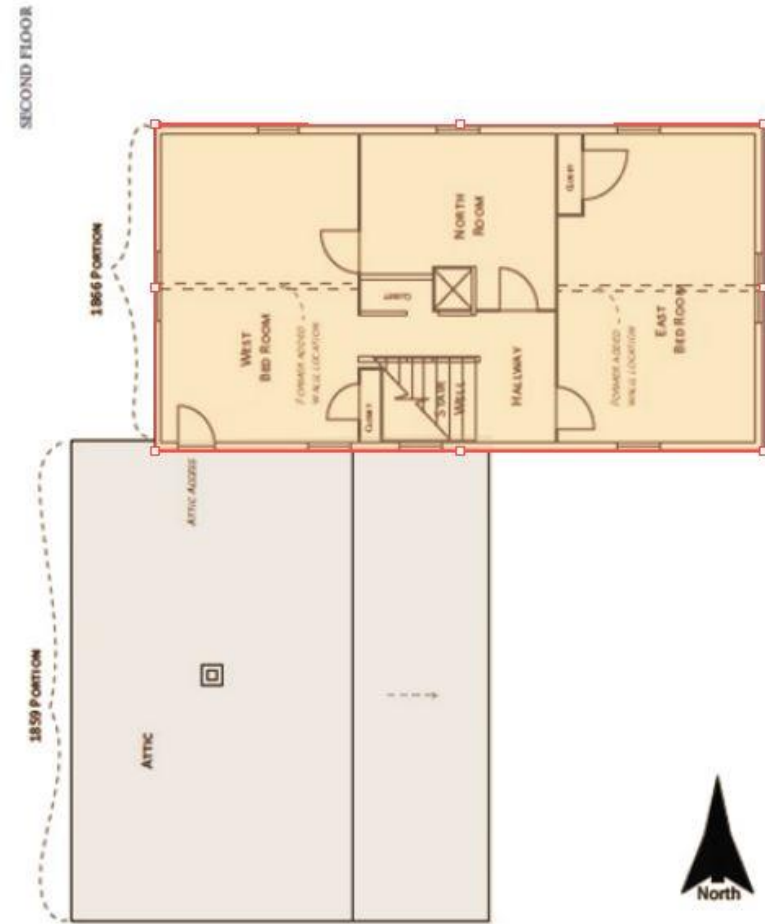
Haller House Second Floor Plan and Roof Plan of Brunn Portion. HHHSR. 2014. 99.
